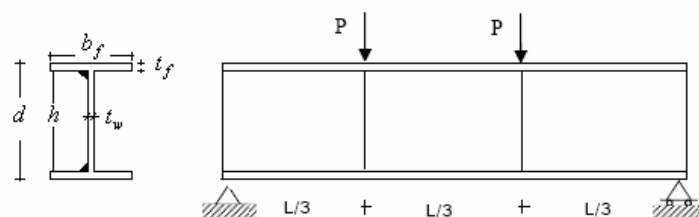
Beam Specimens with Fillet Weld on One Side of the Web.
